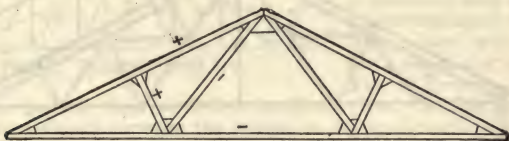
Simple Fink Truss. Spans from Twenty to Thirty-six Feet
